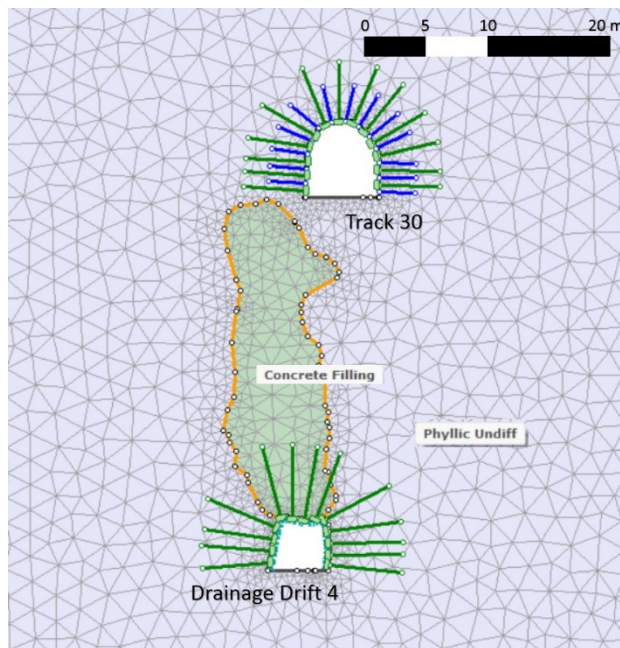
Numerical modelling section showing the position of filled void related to the drainage and haulage level drifts
